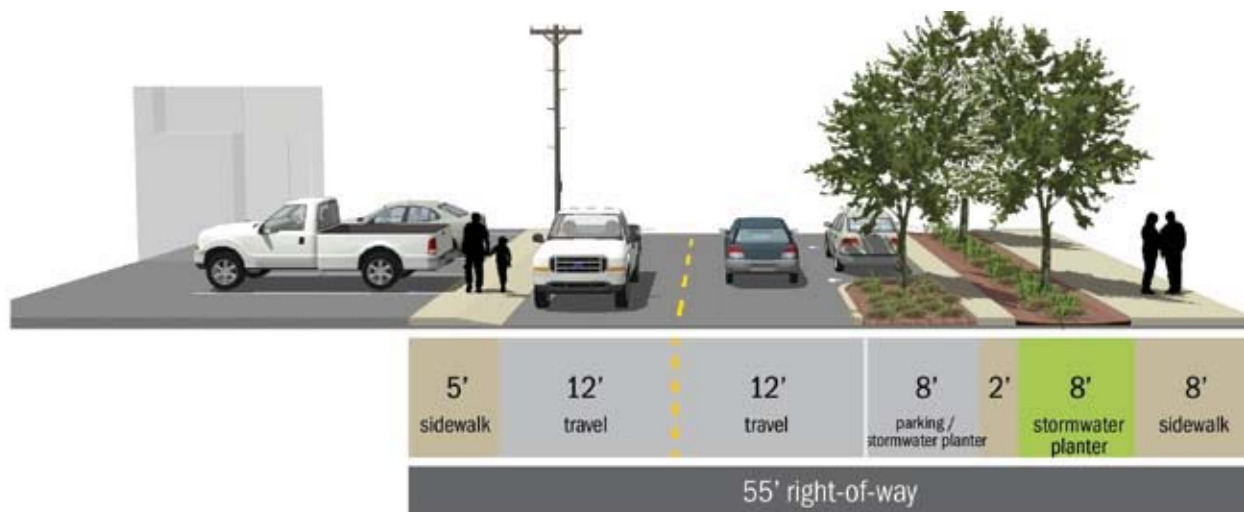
Conceptual Cross-Section for Stubb Street with continuous access (looking east)
